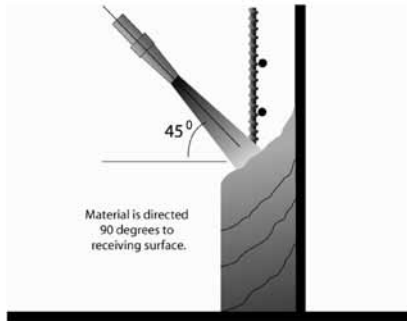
Bench shooting for thick, heavily-reinforced wall.
